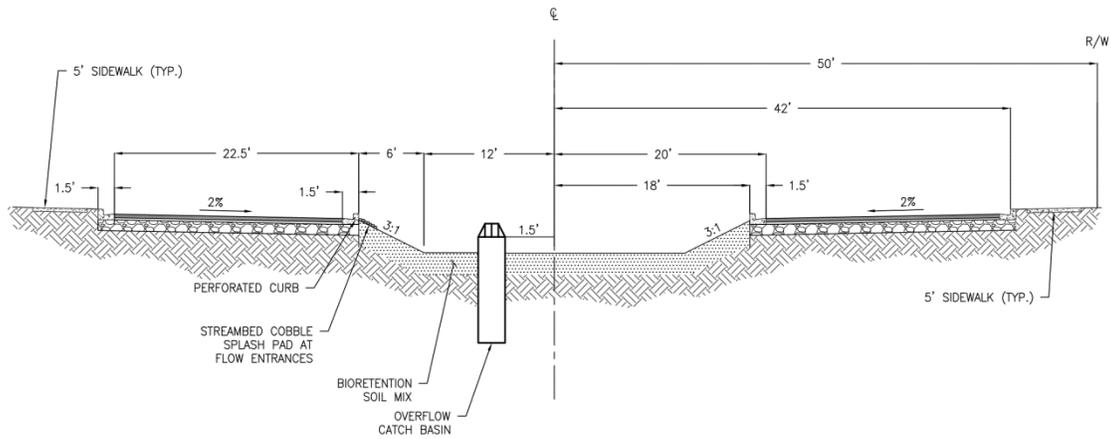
CUL-DE-SAC ALTERNATIVE SECTION WITH BIORETENTION
